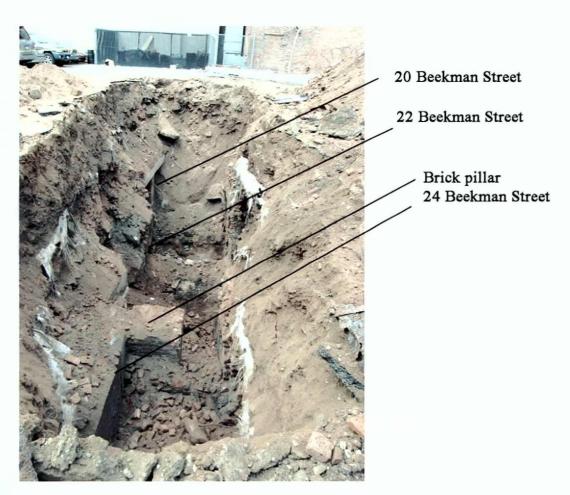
Trenches 1 and 2, end of excavation, looking northwest.
